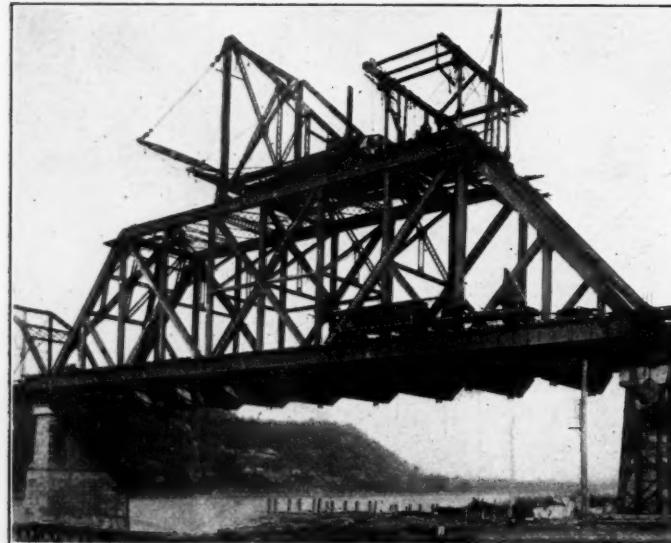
New Span 1 After Removal of Old Trusses Showing Heavy Traveler Erected for Placing Spans 2 and 3.
